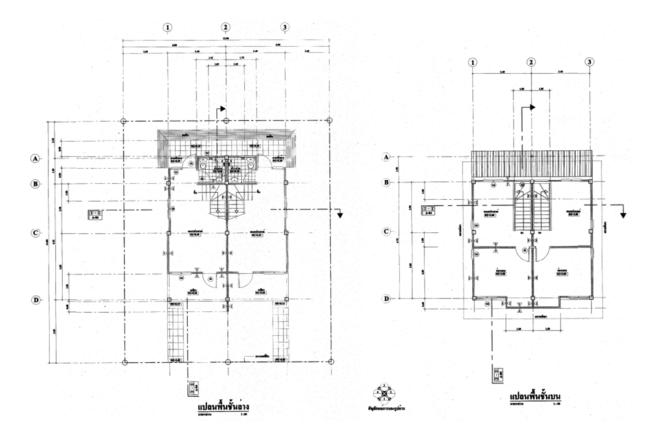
Floor plans of the NHA town house for low and medium income earners.
